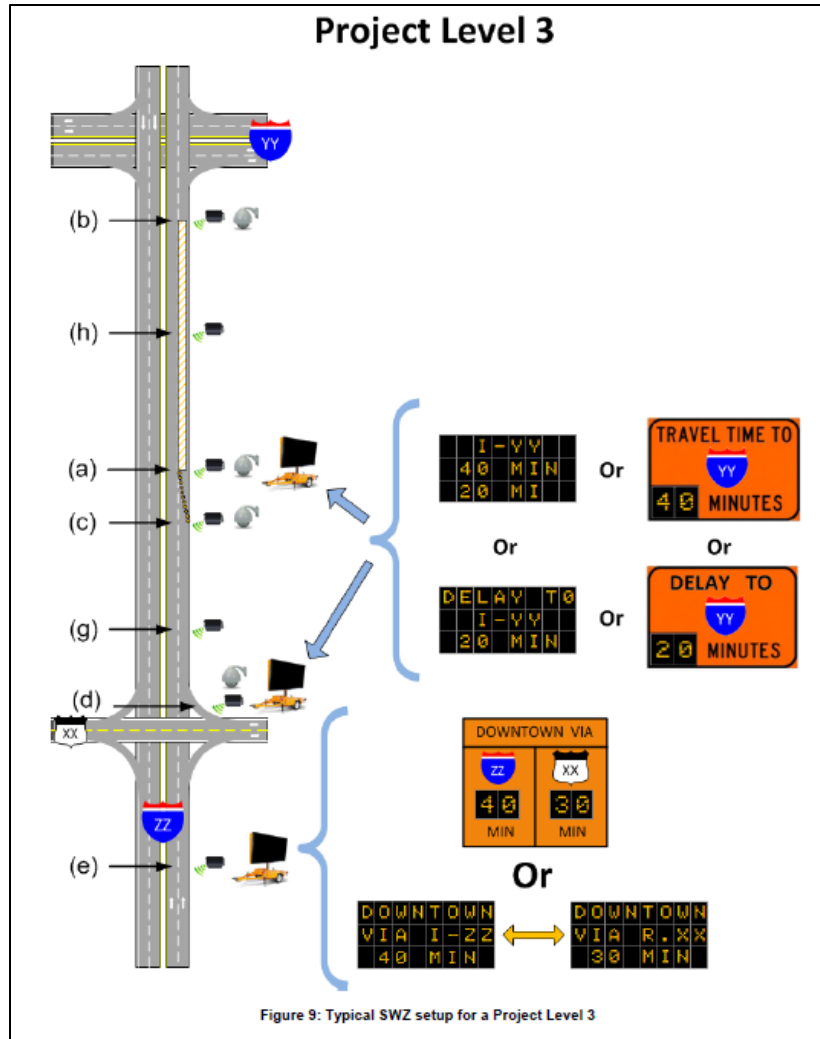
Photo. Example smart work zone layout for a project level 3 (MassDOT, 2016).
